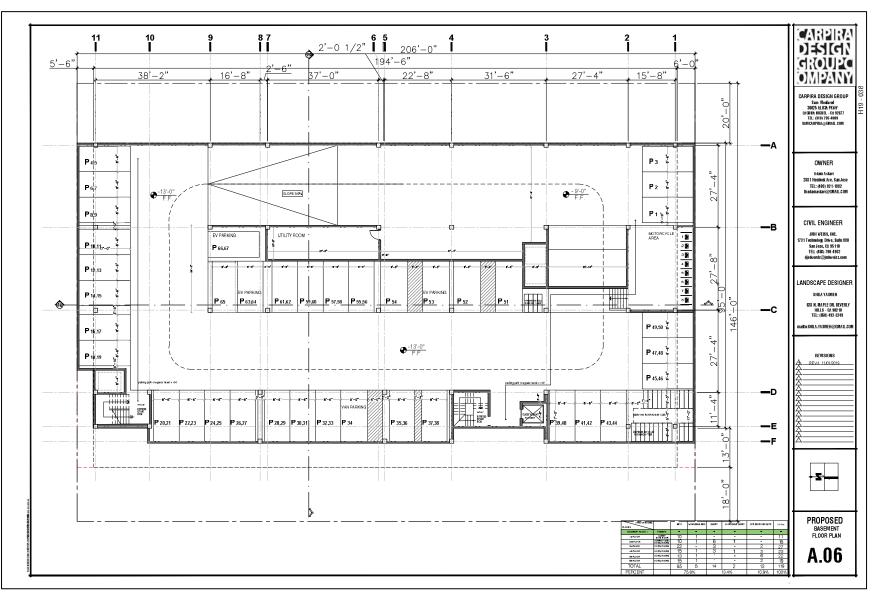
(Cont'd) Proposed Site Plan (Basement Parking Level)
